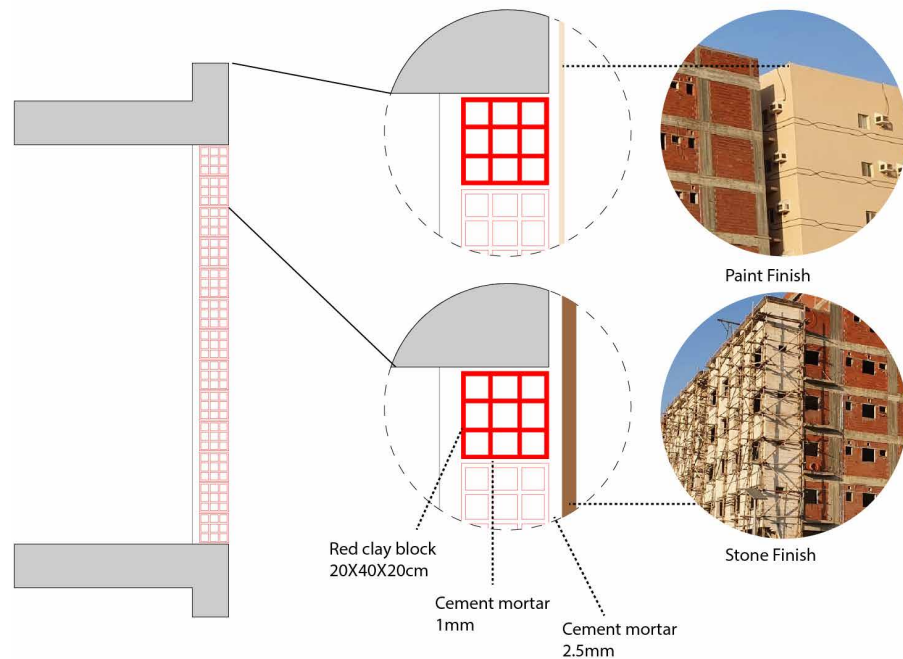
Typical Wall section demonstrating materials used in construction.
